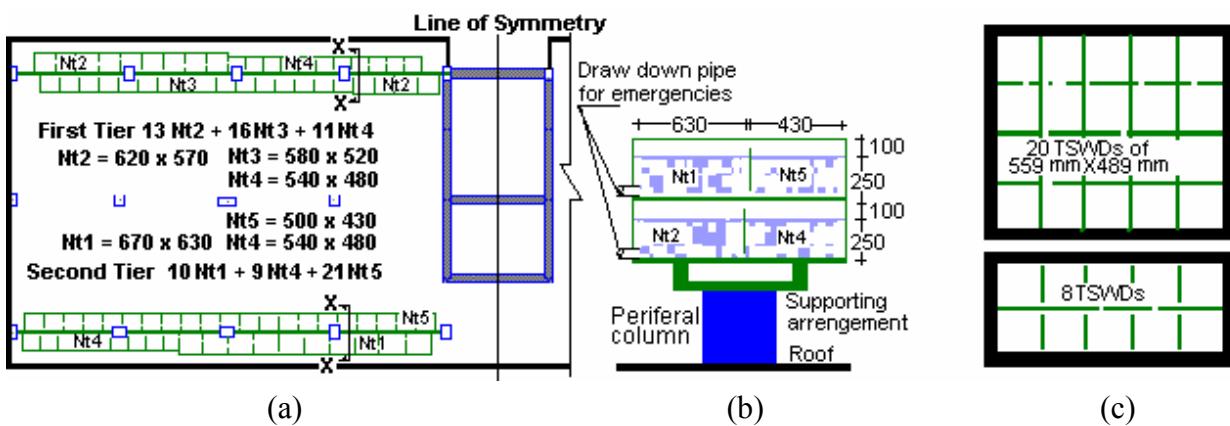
Execution scheme of TSWD retrofitting system: (a) Placement of TSWDs 'Nt' at roof level; (b) Section X-X, (c) OHT modified as TSWD 'Et'
